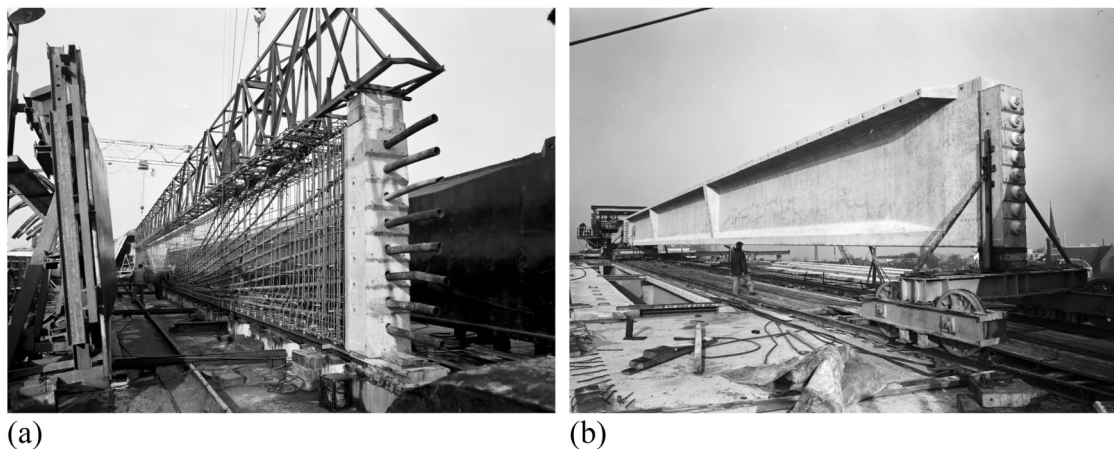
Construction of a slab-between-girder bridge (Van Brienenoord Bridge, Approach Bridge, Rotterdam 1963) (Rijkswaterstaat, 2020): (a) prefabrication of girder on site; (b) on-site transportation of prefabricated girder using railway track.
